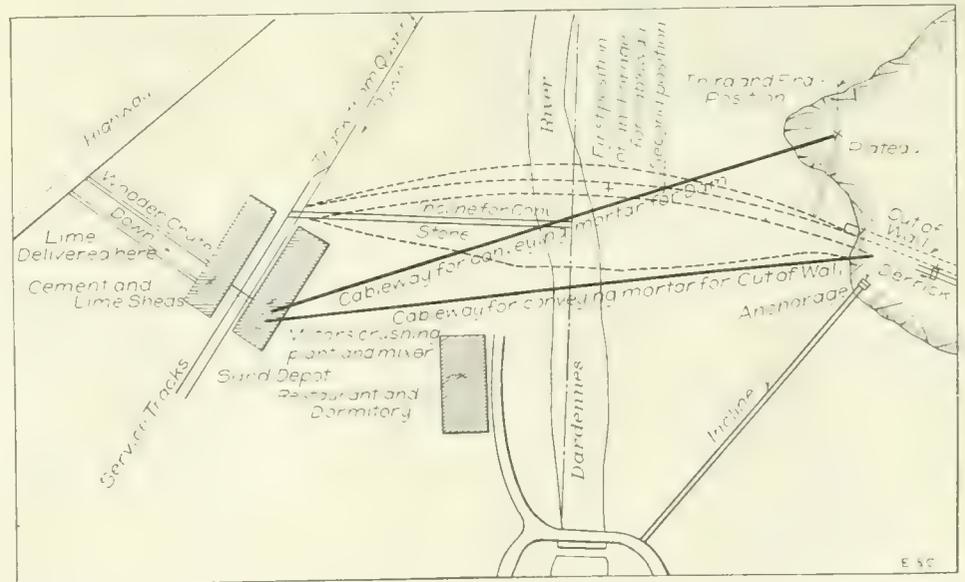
Arrangement of Contractor's Plant for the Construction of the Dardennes Dam.
